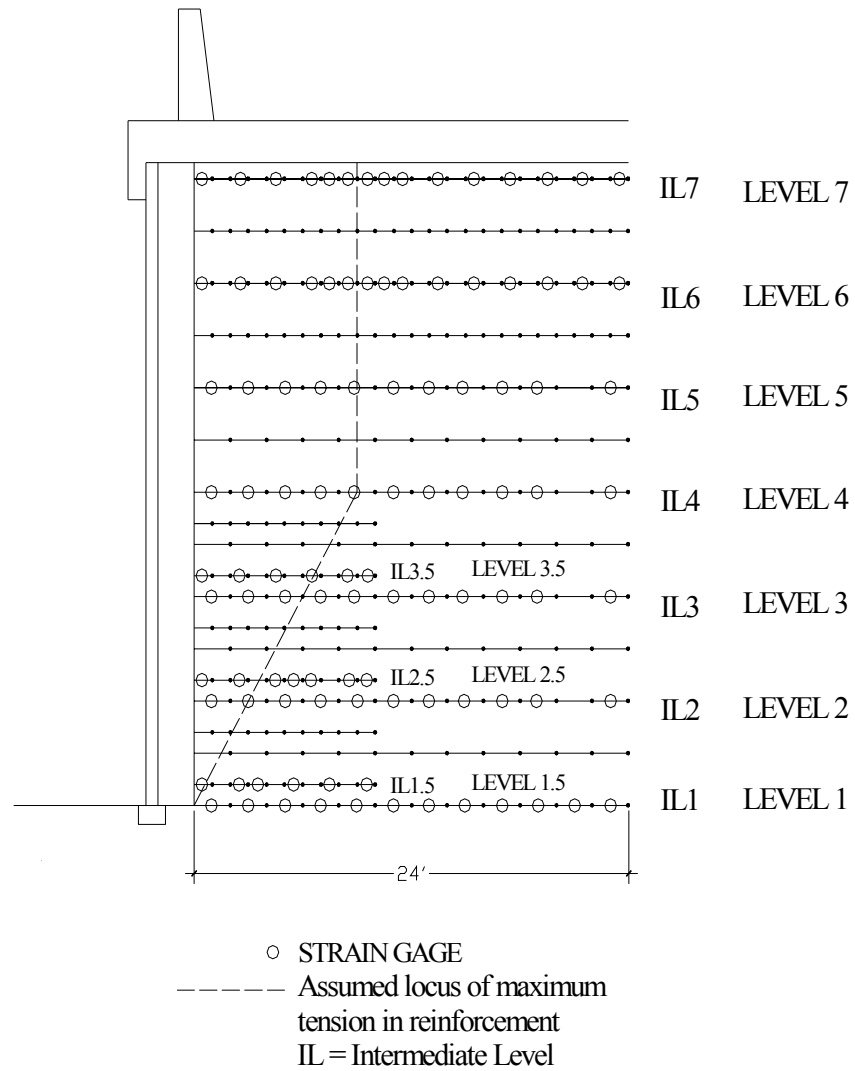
Elevation view of the Wall R-346-1C with primary and intermediate reinforcement.
